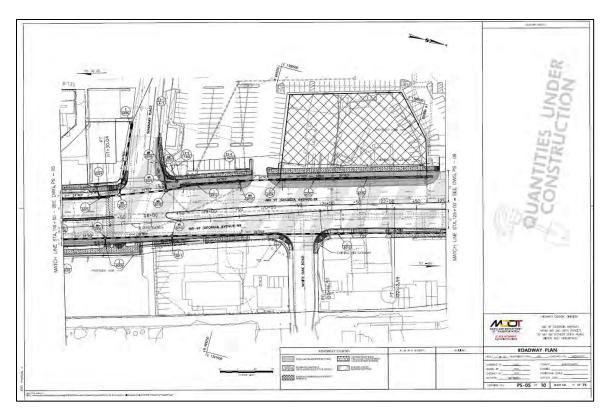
Plan View – Georgia Avenue at Seminary Place and White Oak Road
